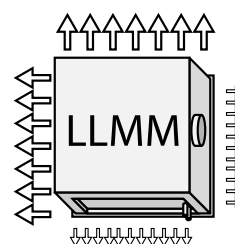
Example of nozzle setting for a single-module unit - LLMM
